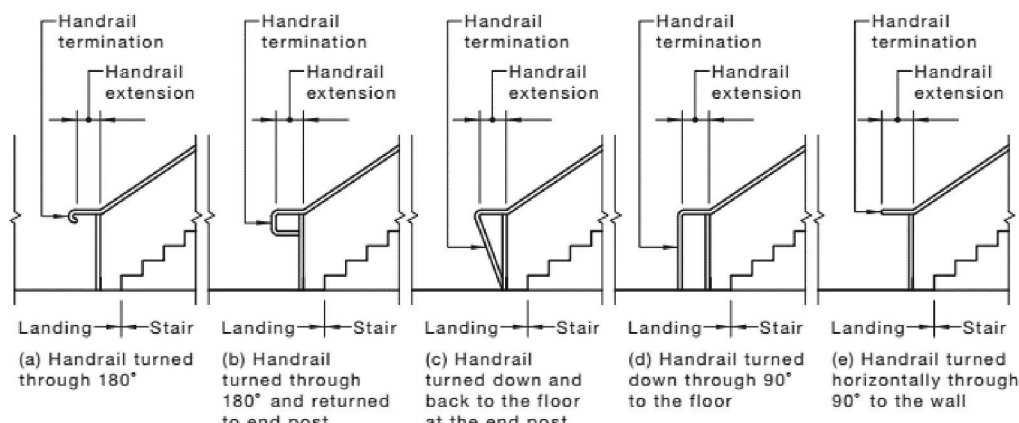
Clause 11.1 and 12 of AS1428.1-2009 - Handrail Details
